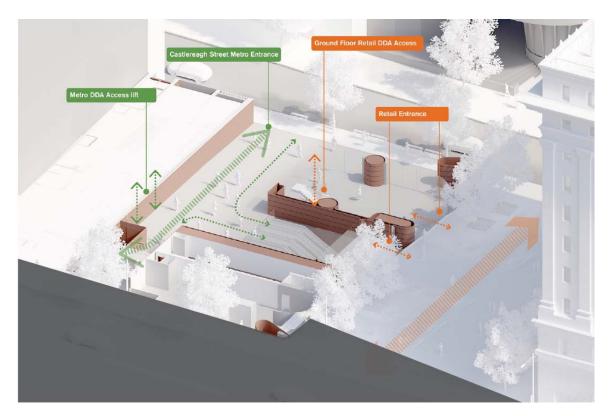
Pedestrian access and circulation at the Lower Ground Floor (Castlereagh Street level)
